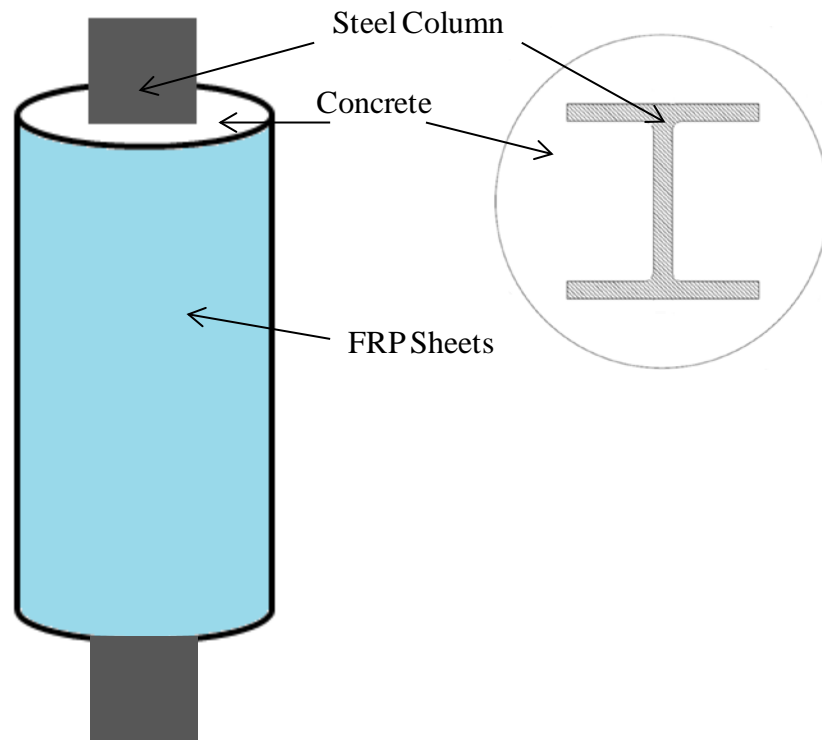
Illustration of the Proposed Strengthening Approach for Steel Piles
